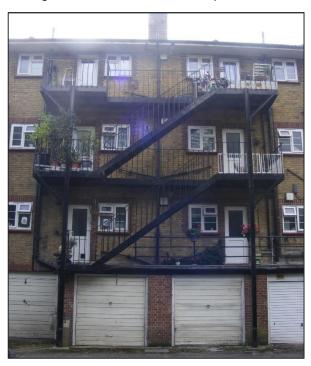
Photo of Existing Staircase 1 - Garage Stairs
